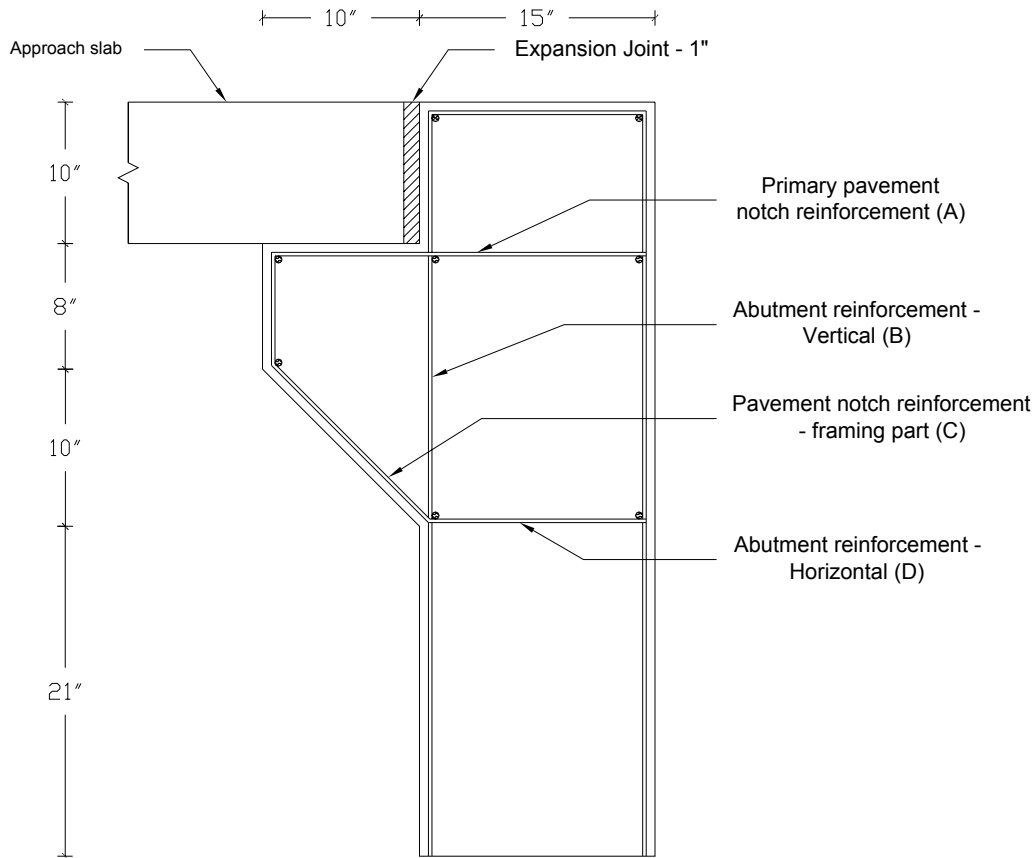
Abutment dimensions and reinforcement details used for a typical two-lane non-integral bridge in Iowa
